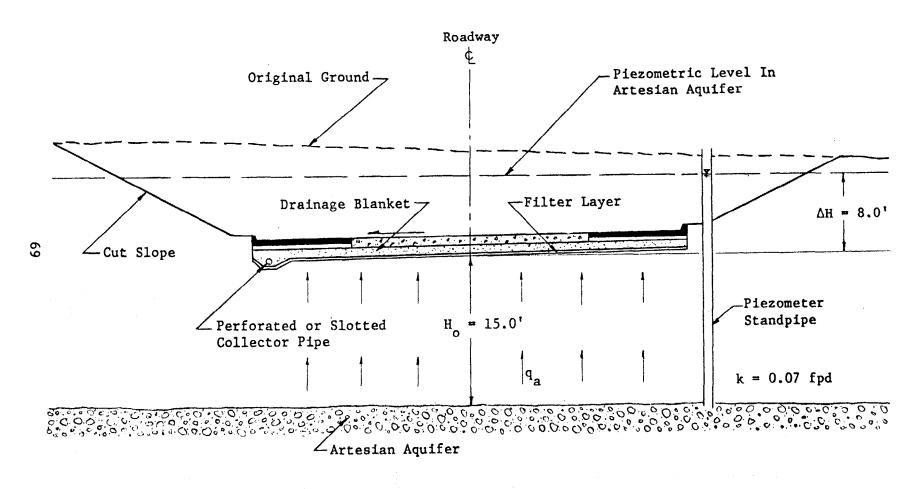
Artesian Flow of Groundwater Into a Pavement Drainage Layer - Dimensions and Details for Example 4
